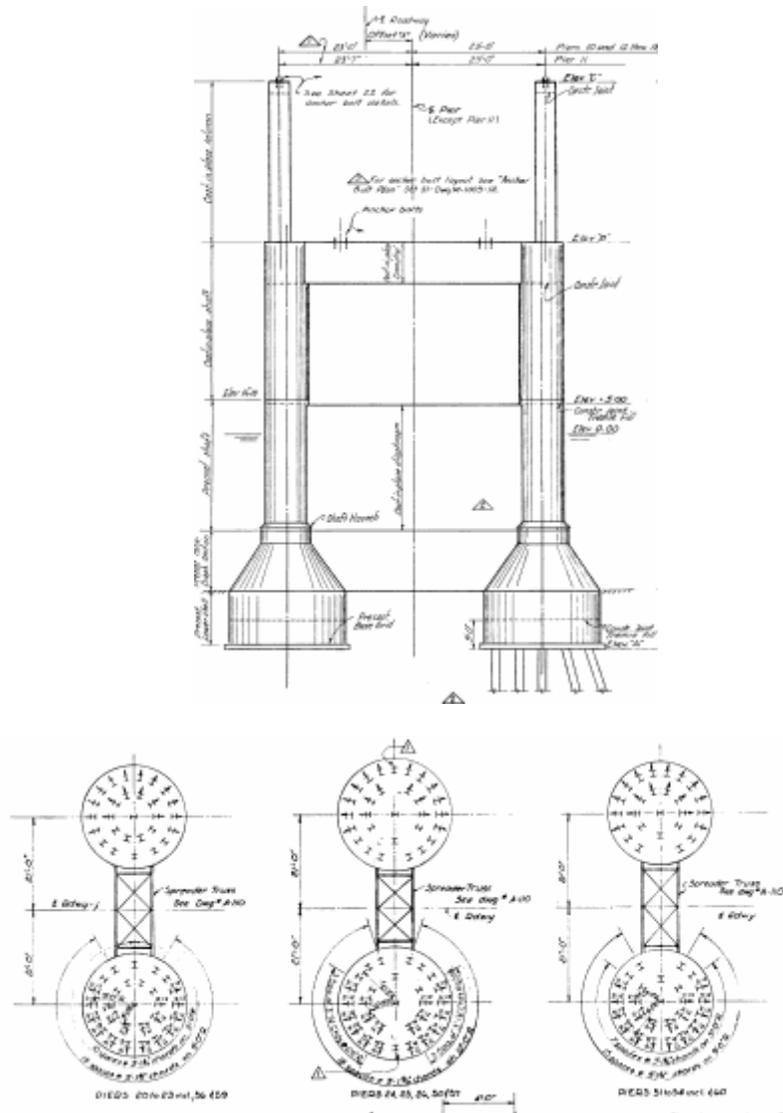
Typical profile view of two column pier with belled foundation and typical plan view of H-pile layout in driving template at base of bell (source: Caltrans, 1953 Richmond-San Rafael Bridge as-built drawings).
